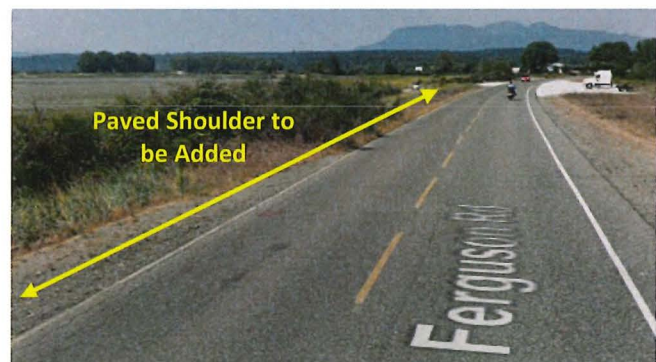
Metro Vancouver Section of Ferguson Road to be Widened with Paved Shoulder on West Side
